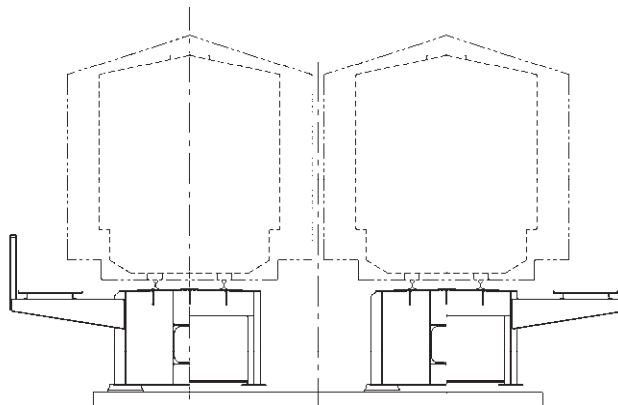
Section of Steel Girder Bridge (Deck Plate Girder)
